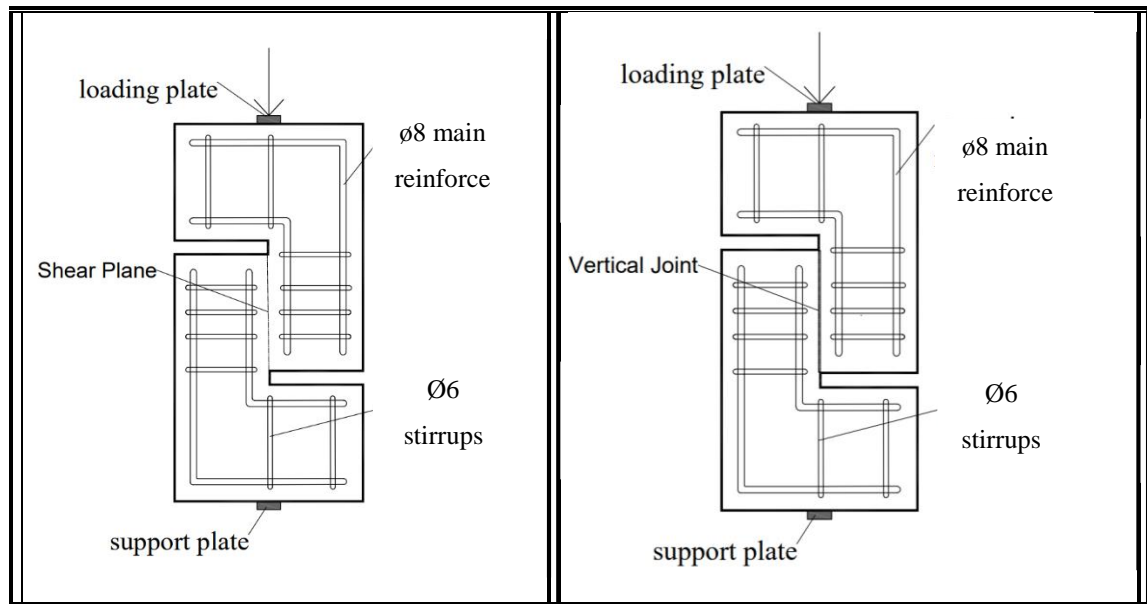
4 Geometric and reinforcement details for Control and EXF specimen.
